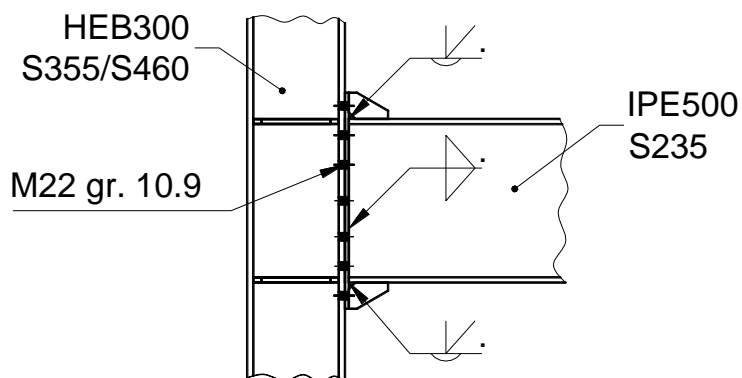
Bolted extended end-plate beam-to-column joint.
